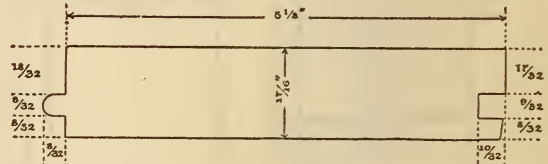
1¼ by 6 inch kiln-dried flooring, green, 5⅜-inch face
